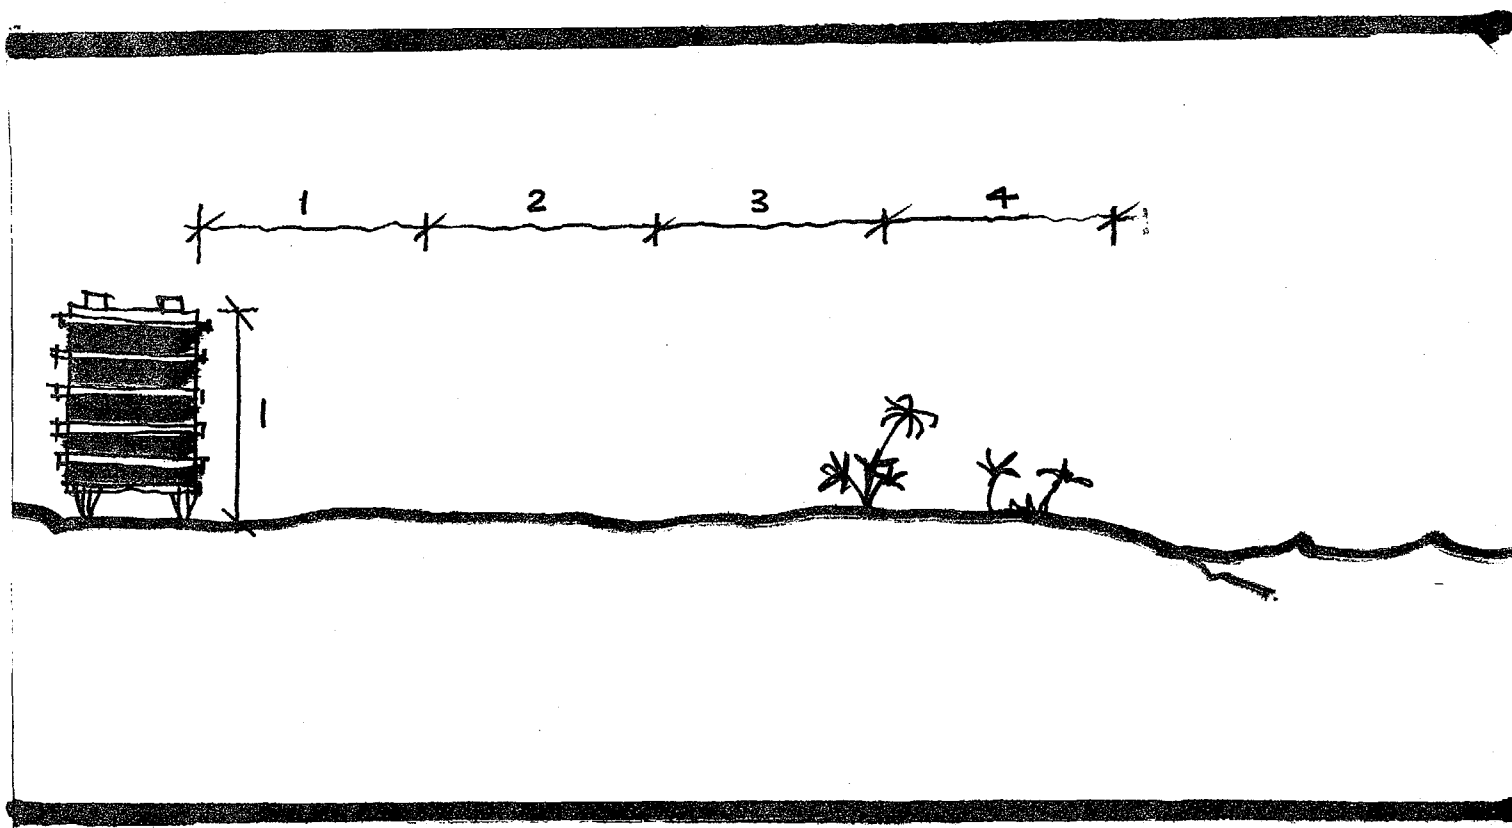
FIG.A : Building height made proportional to the building setback from the shoreline. Building height is one fourth of building distance from the shoreline.
